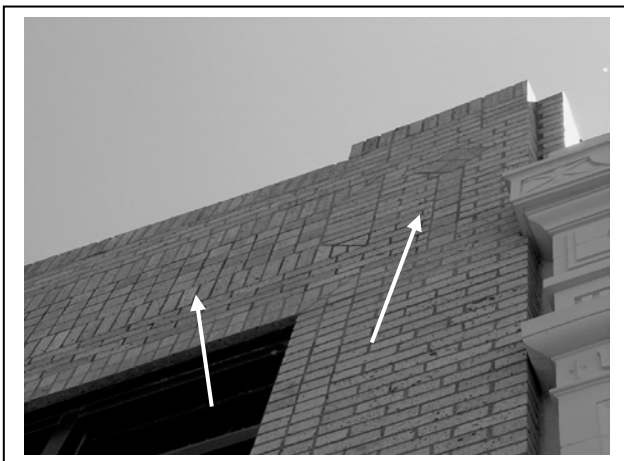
Vertical projecting pier with orange-yellow square bricks arranged in rectangular panel and diamond shaped element.
